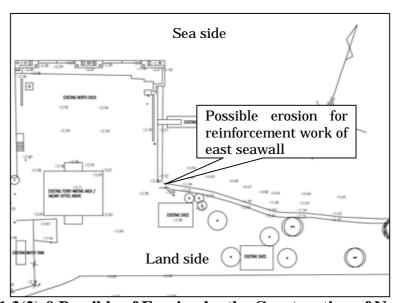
(2)-9 Possible of Erosion by the Construction of New Seawall
